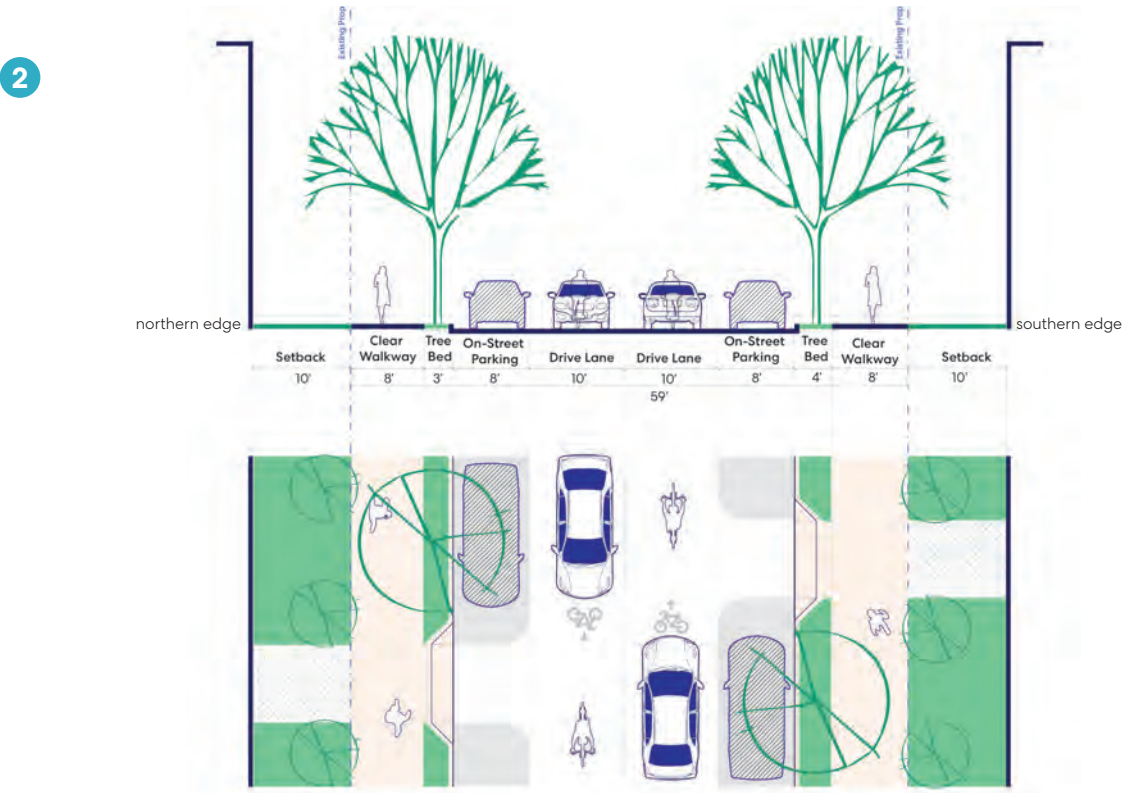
Typical Olive Avenue section between Ash Street and El Camino Real
